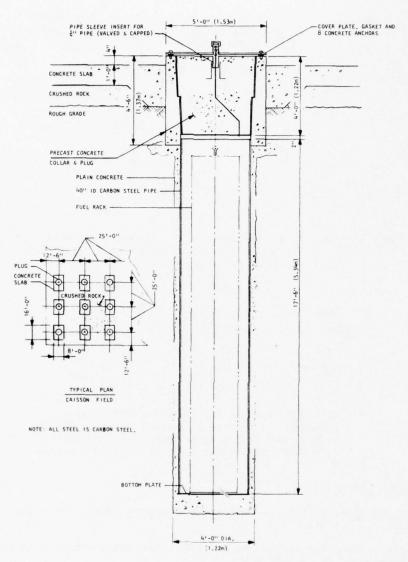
Detail of a Dry Caisson Used for Storage of Packaged Spent Fuel
